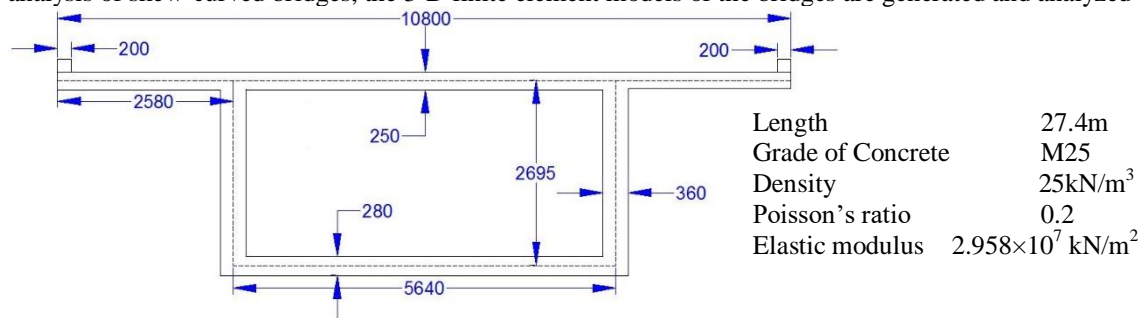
Cross-section of Han-Jiang Bridge [18] (dimensions in mm)
